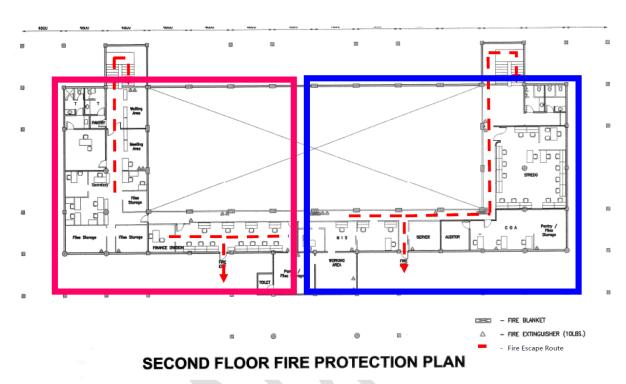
Golden Shell Pavilion 2nd Floor Evacuation Plan
